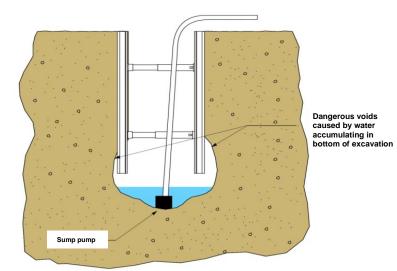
Wet excavation walls collapse, causing dangerous voids
